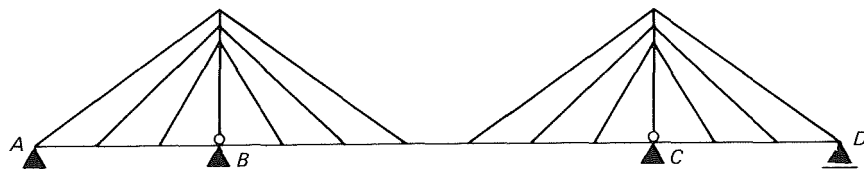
Long span multitower continuous girder bridge. (Courtesy of the Institution of Civil Engineers, from reference 10.)
